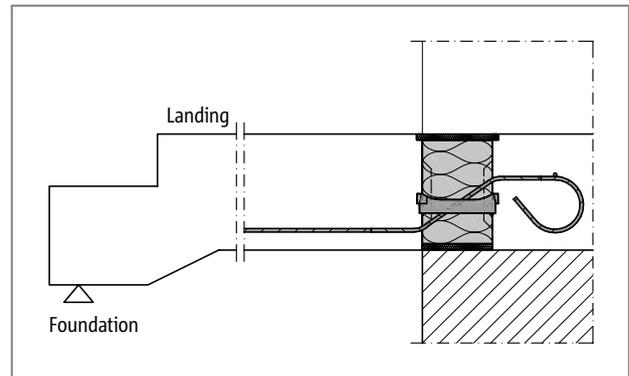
Schöck Isokorb® XT type Q: Connection stair landing with single wall thermally insulating masonry (XT type Q-V1 to V4)
